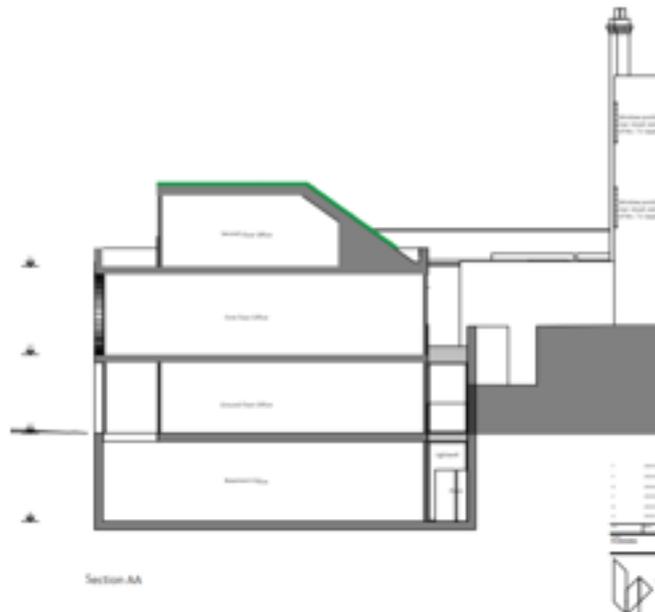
Proposed section from previously refused scheme (Ref. P2020/1707/FUL)
